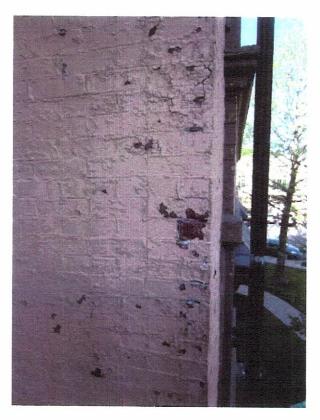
North elevation chimney. Note mortar loss in exposed brick.
